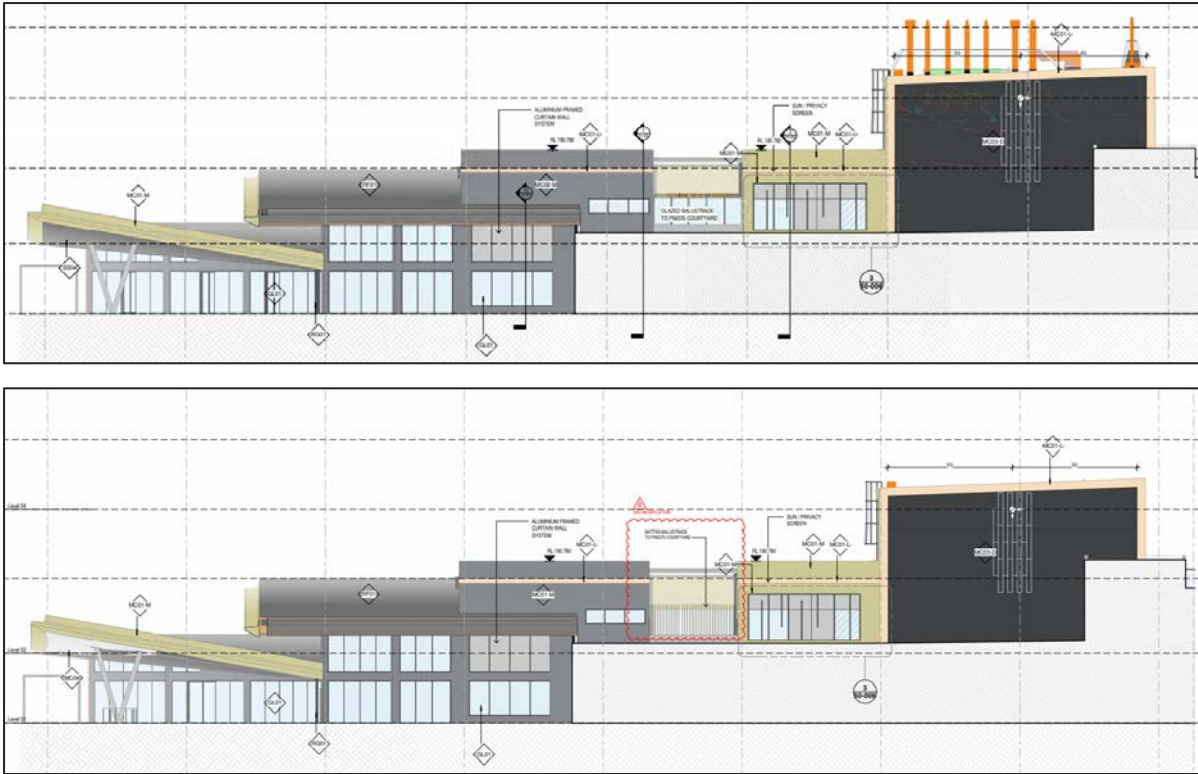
| Approved balustrading (above) and proposed balustrading (below) (Source: SSD 8647 MOD 3 Approved Plans and Applicant’s Modification Report)
